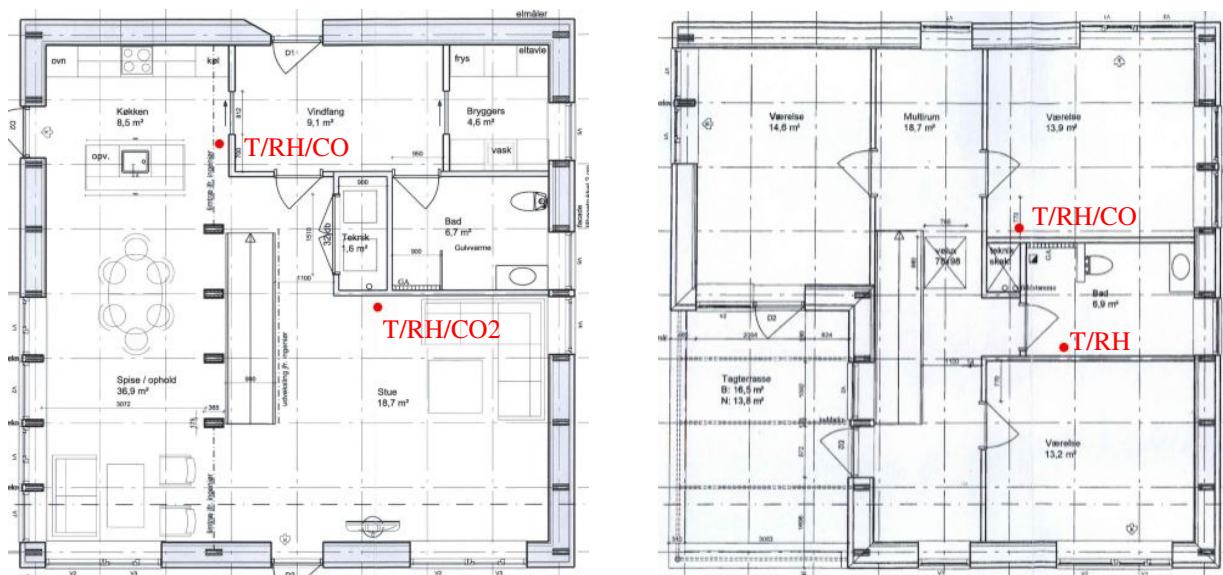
Ground floor (left) and 1st floor (right) plan of Stenagervænget 49
